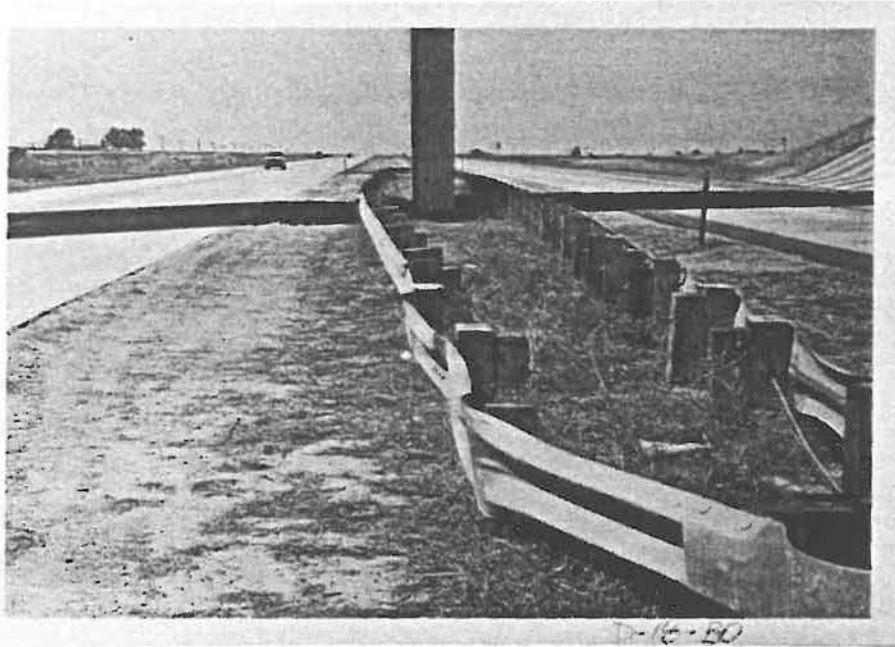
Colorado Type 3F end treatment on I-76 at milepost 29. End treatment ties in to Type 3 guardrail.
